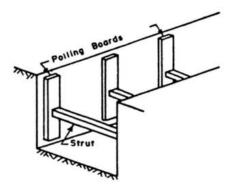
Timber vertical polling boards Source: Building construction (punmia *et al*, 1987)
